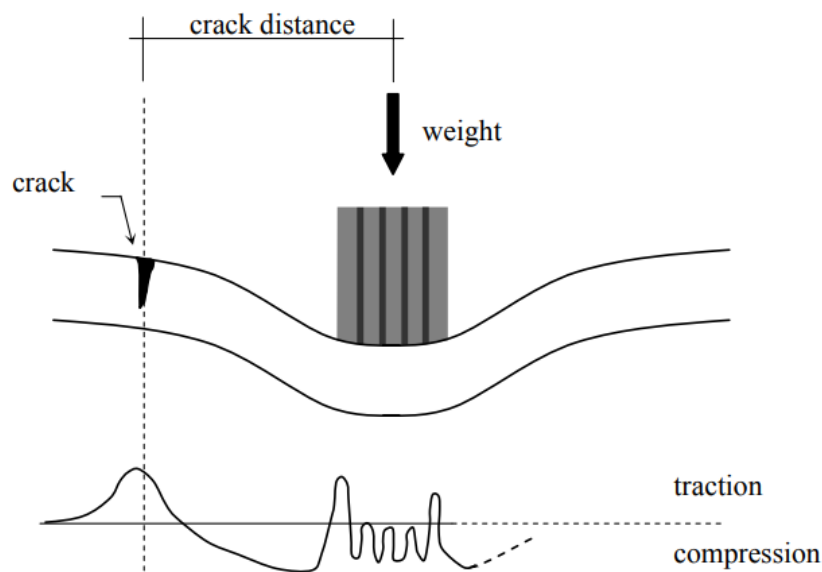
Illustration of structural bending and stresses in asphalt pavement from loading [167].
